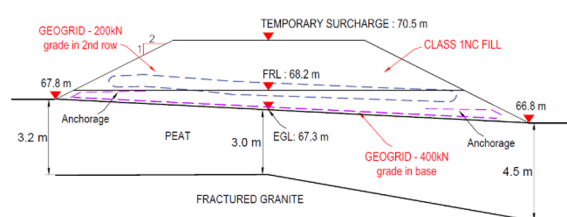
Typical embankment cross-section with geosynthetic basal reinforcement.
